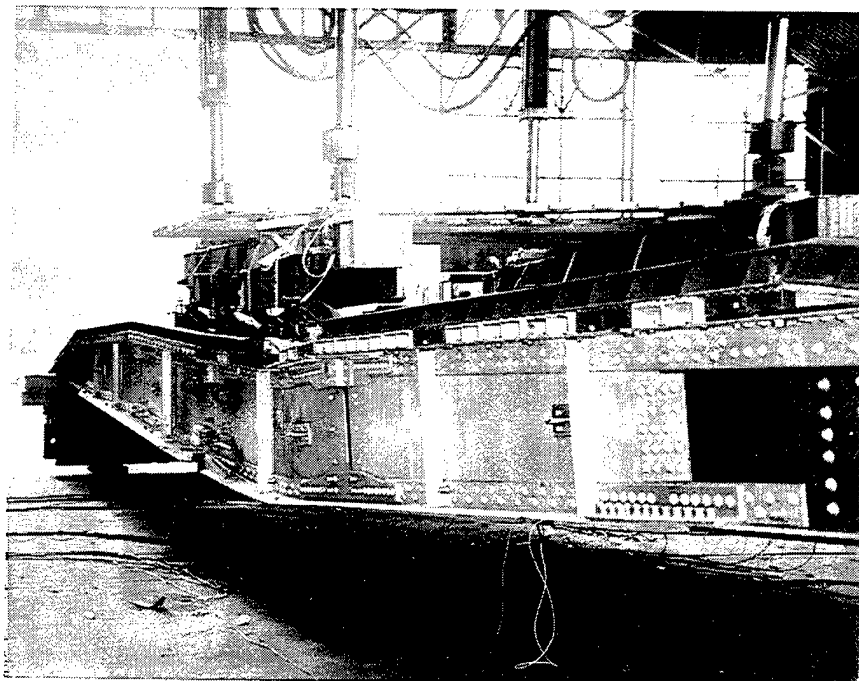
A side view of the collapsed No. 2 Class 70 modified AVLB after the bridge failure test. It buckled in the top chords and girder plates in the center panel assembly of the female bridge section.
